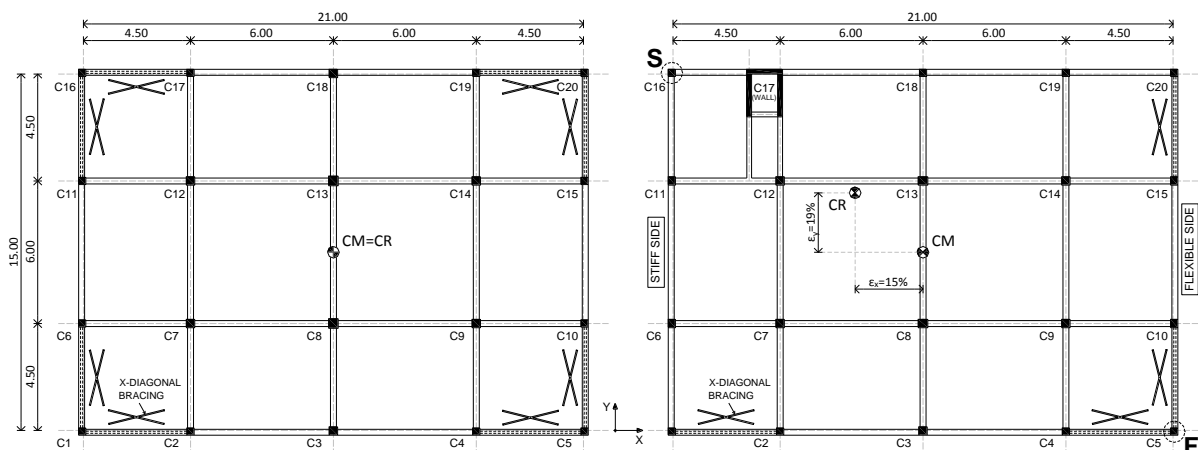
Typical layouts for the symmetric (left) and the eccentric (right) 3-story and 5-story buildings
